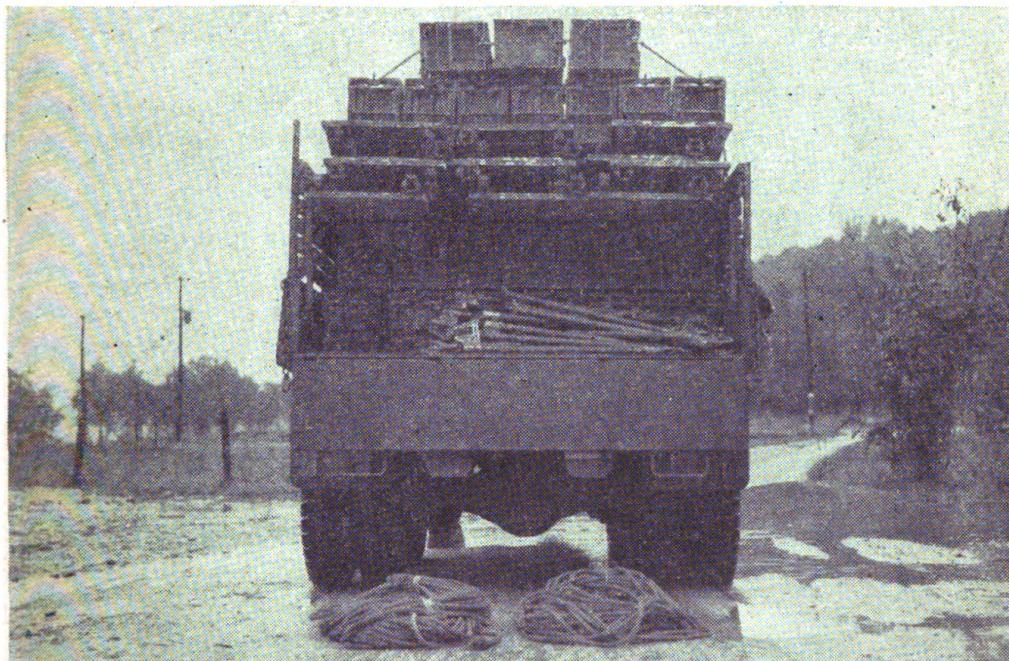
Footbridge equipment loaded on 2½-ton truck.
